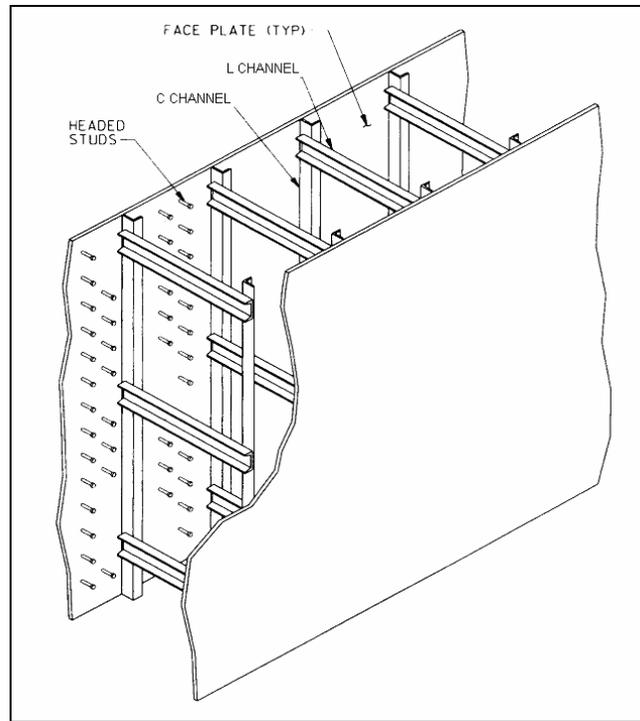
Typical AP1000 Structural Wall Module Detail
